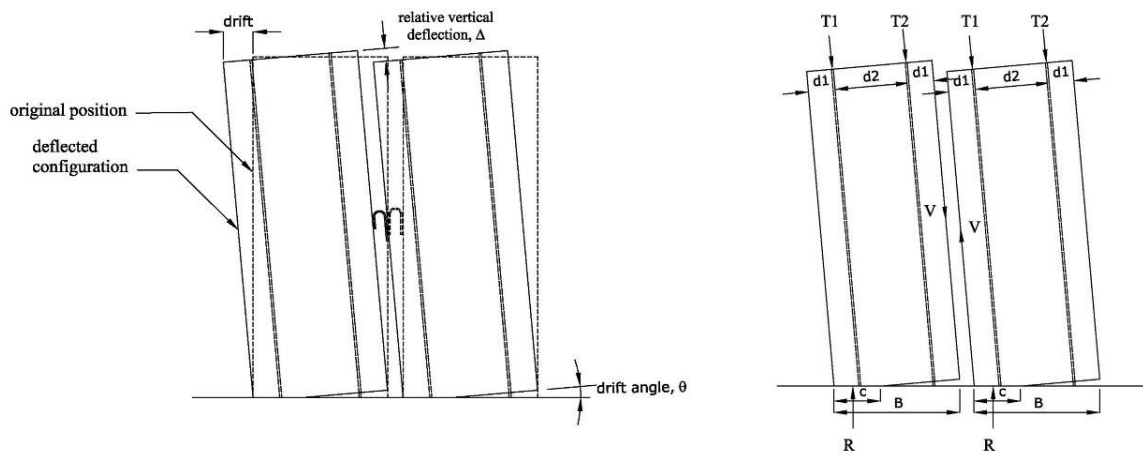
a) Deflected shape of coupled walls; b) forces in walls coupled with UFPs
